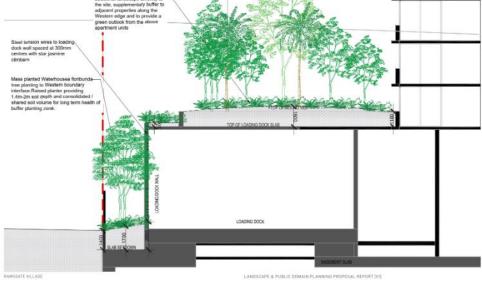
Previous Planning Proposal scheme ground level landscaping
